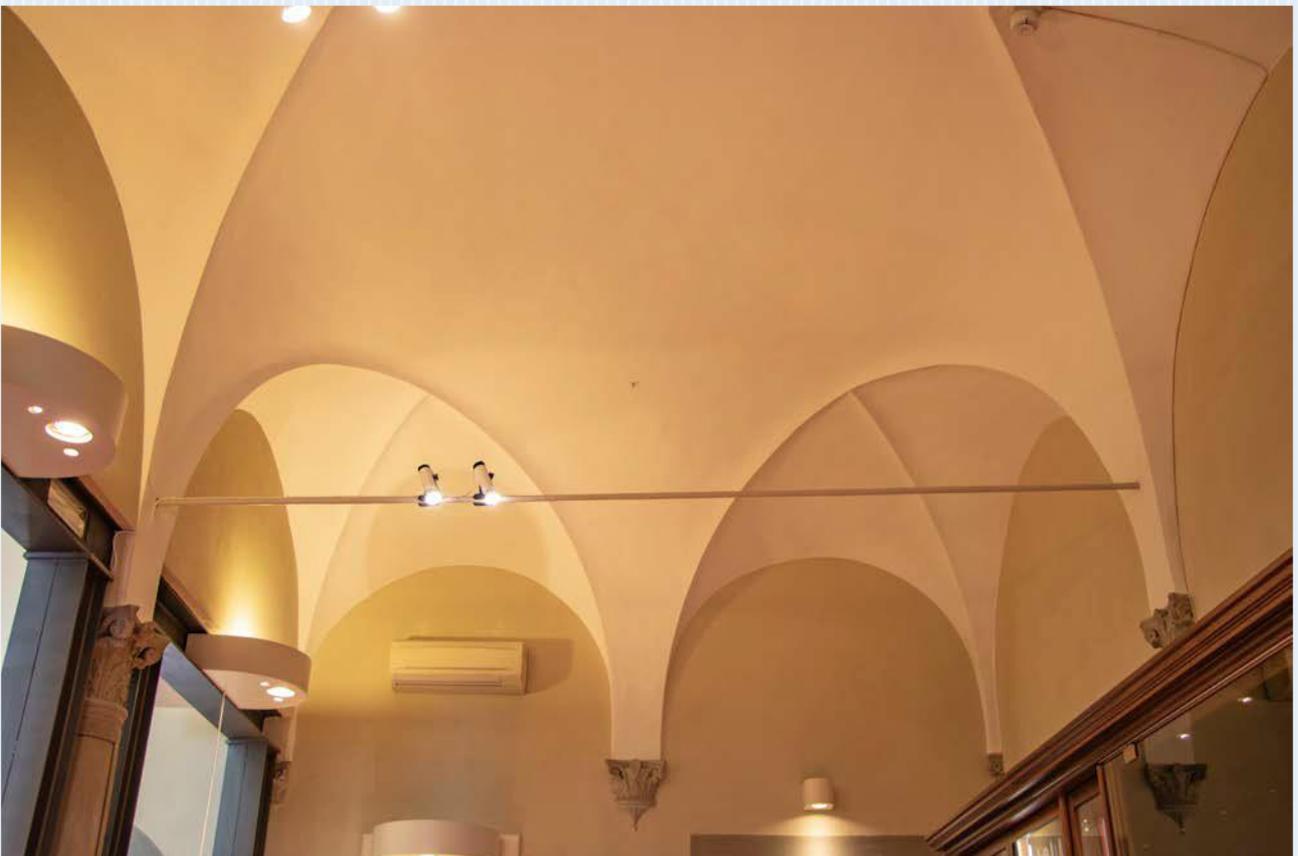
Lunette vaults ceiling of the central hall Maurizio Bossi. Picture taken at the ground floor with the entrance of the Palazzo on the back
